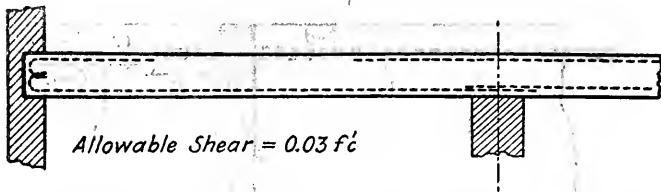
Typical Reinforced Concrete Beam; Special Anchorage of Longitudinal Bars
